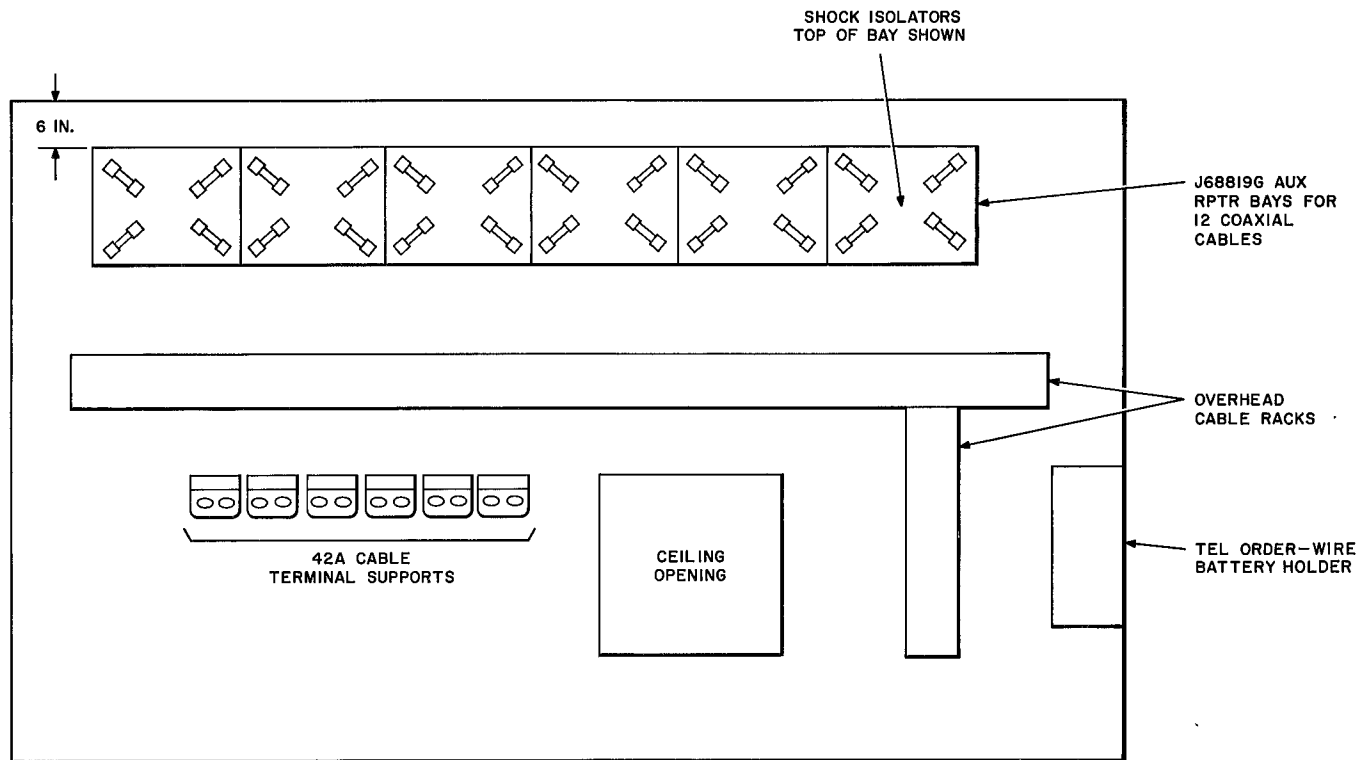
Typical Layout of Underground Auxiliary Repeater Station
